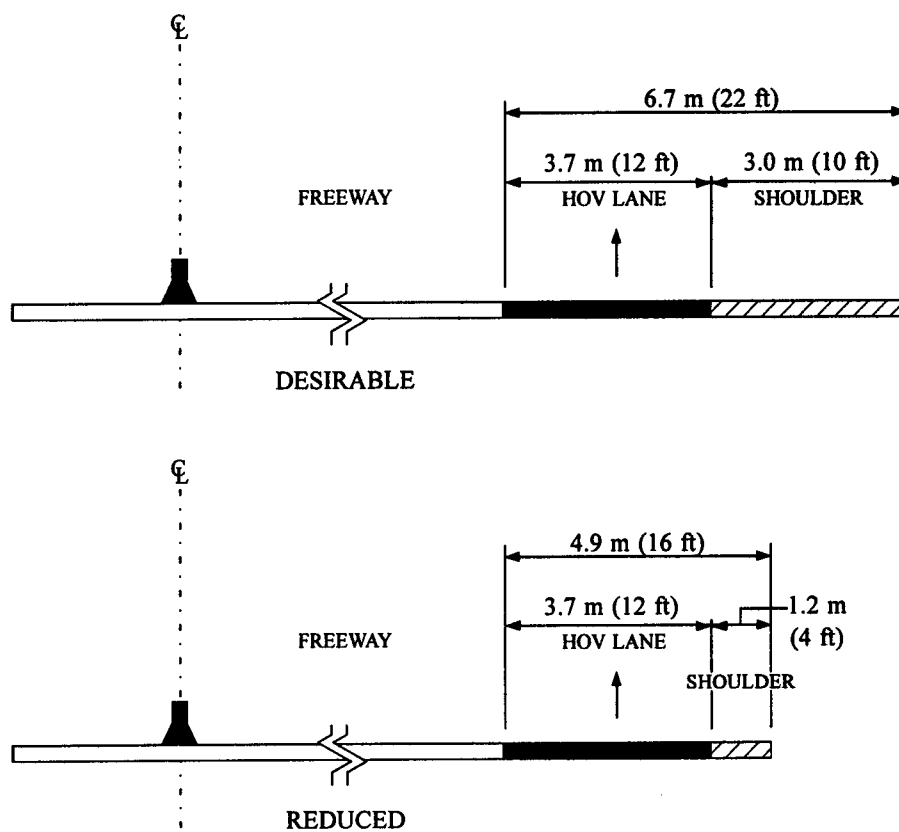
Examples of Cross Sections for Concurrent Flow HOV Facilities Located on the Outside of a Freeway
